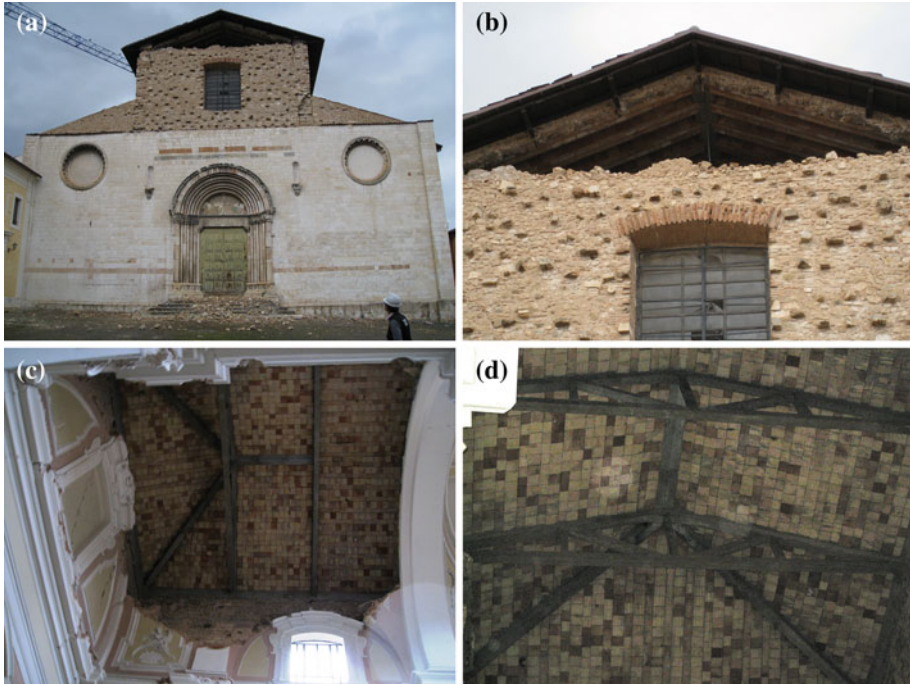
San Domenico church in L'Aquila: a the façade; b the collapsed gable of the façade; c–d collapse of the transept vault due to substitution of the roof, made by r.c. trusses
